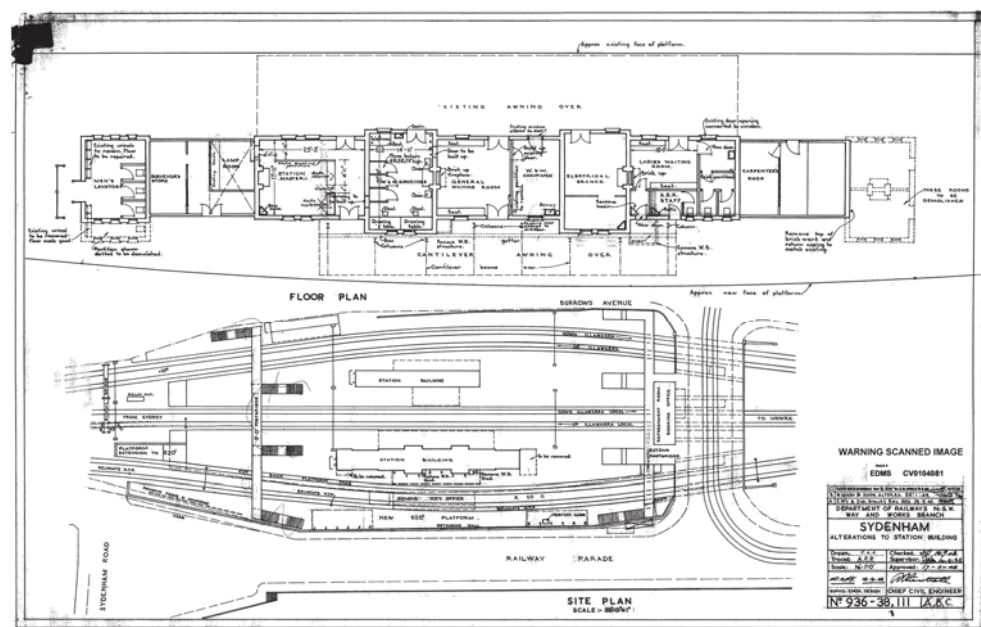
1948 Plan of Sydenham Station showing current platform configuration and earlier plan configuration of Platform 2/3 building (Source: State Records, NSW, EDMS CV0104081)
